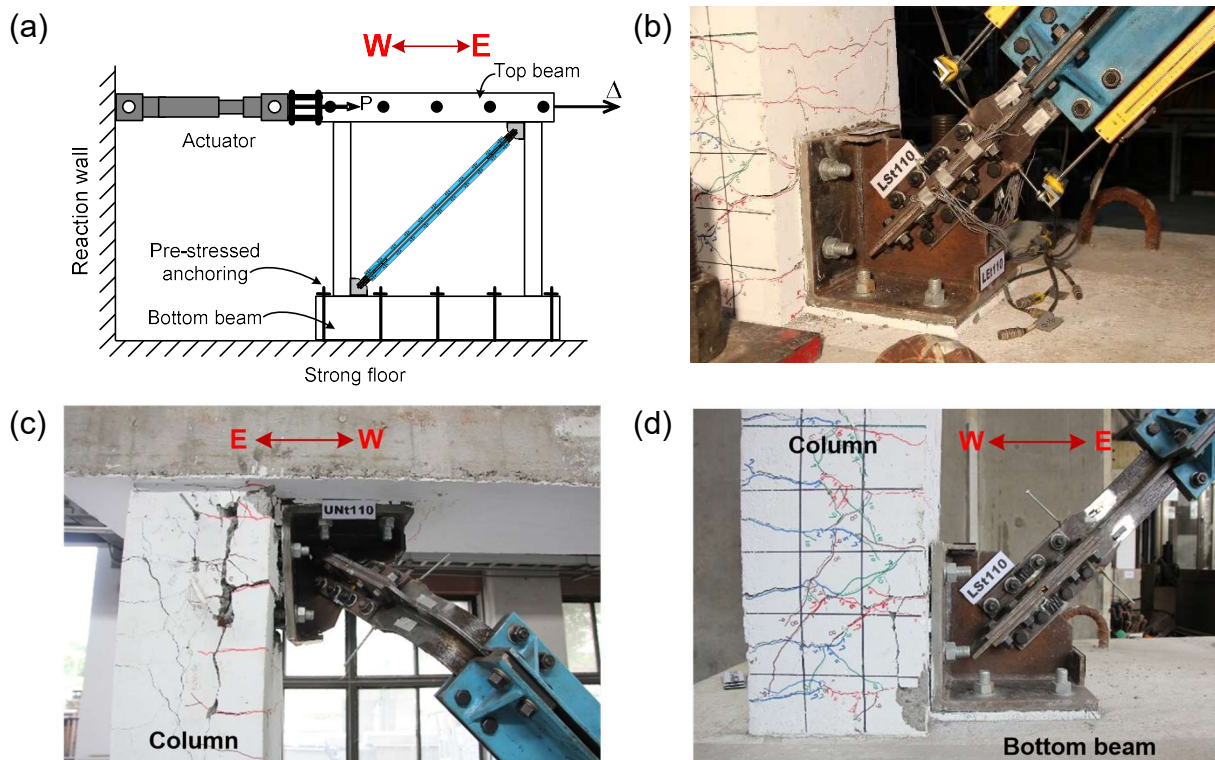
(a) Side view of the test setup used in Mahrenholtz et al. (2015), (b) lower anchor bracket and initial cracking of concrete close to the bracket, (c) buckling of the transition segment of the BRB of the upper and (d) lower connection. Source: Mahrenholtz et al. (2015).
